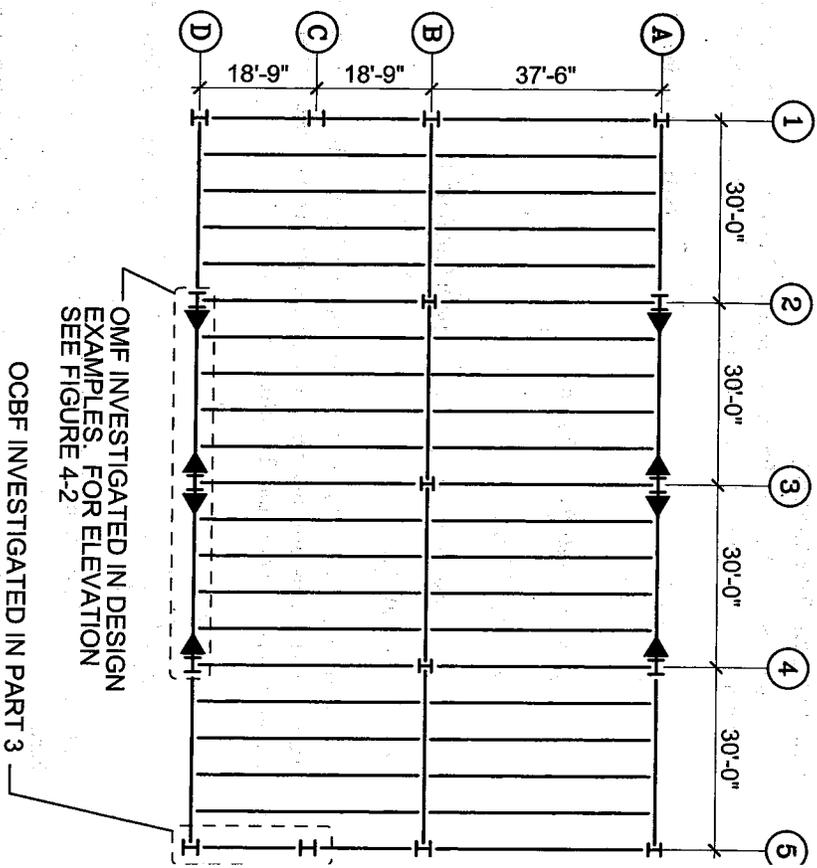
OMF and OCBF roof plan for Examples 3.1, 3.2, 3.3, 4.1, 4.2, and 4.3.
